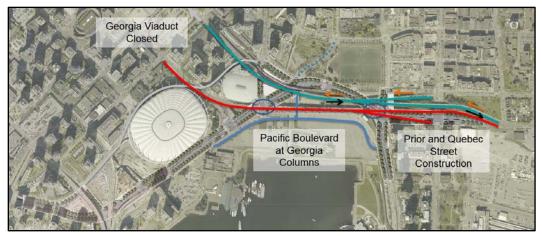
Construction Phasing Stage of Proposed Plan (MMM/WSP, 2017)
